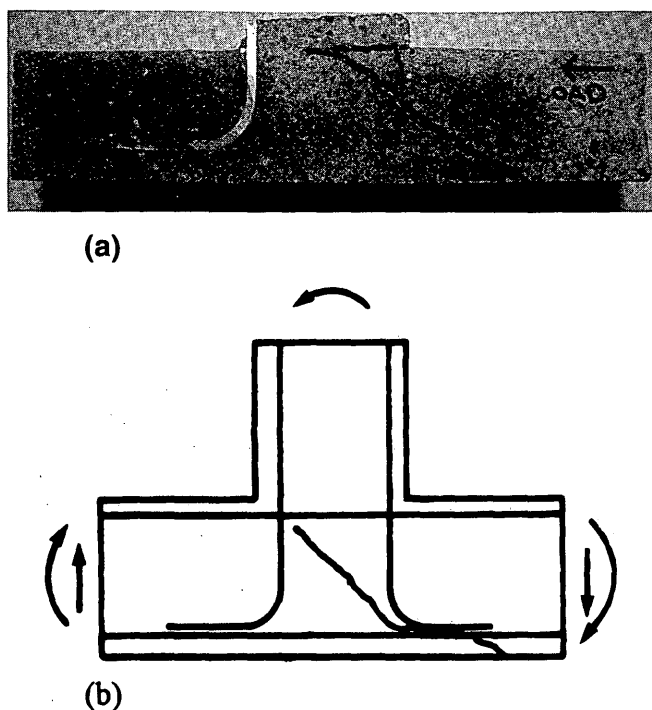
Cracking patterns in (a) small-scale column and footing joint and (b) column and beam joint.
